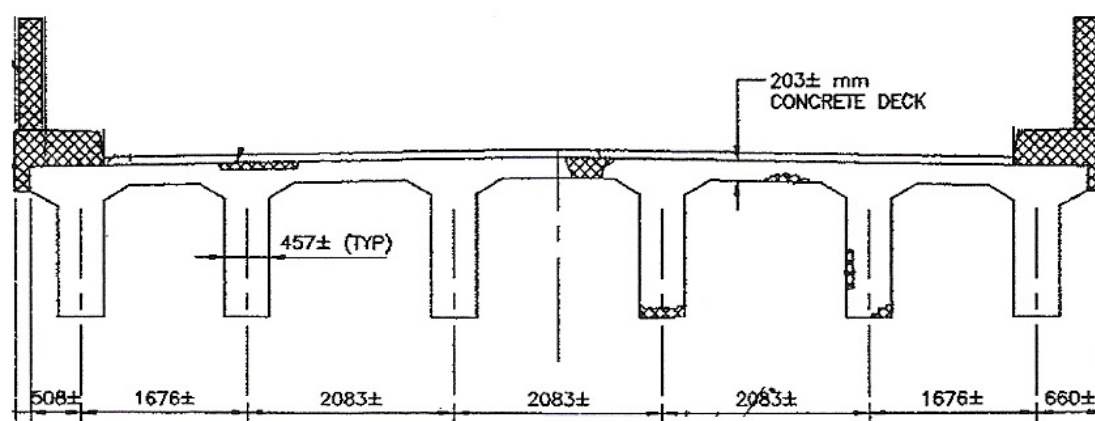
Typical Cross-section of Cedar Creek Road Underpass (Dillon Consulting 2001).
